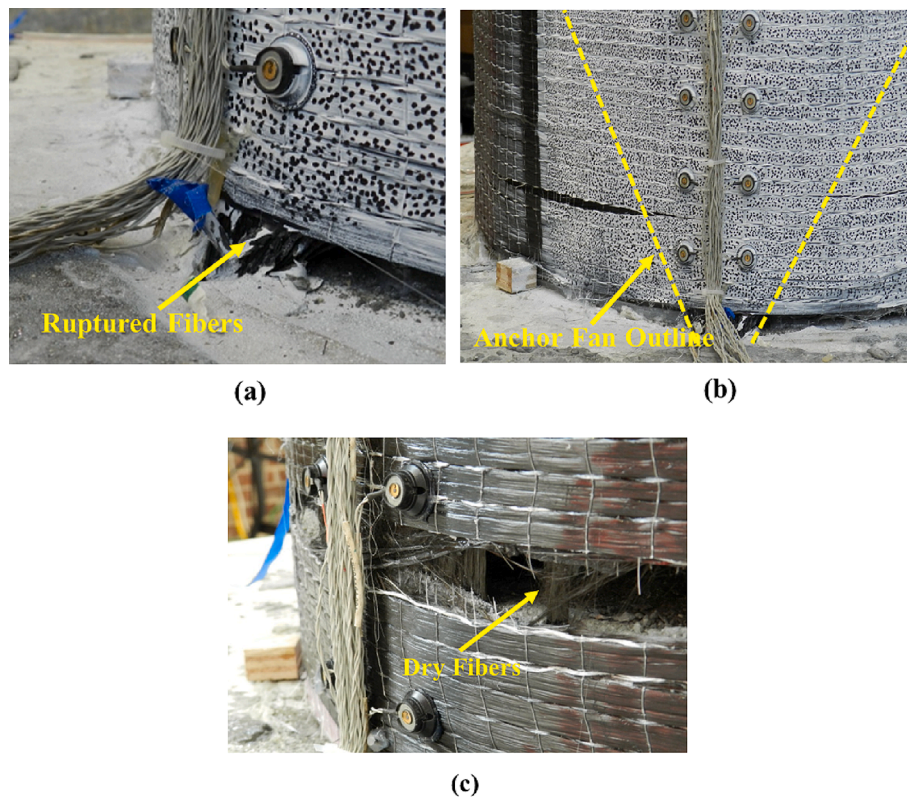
Anchor Failure in Column C-2 a) Anchor Rupture (C-2-A1-381) b) Splitting of Hoop Fibers (C-2-A1-381) c) Dry Fibers Pulling Out (C-2-A2-254).
